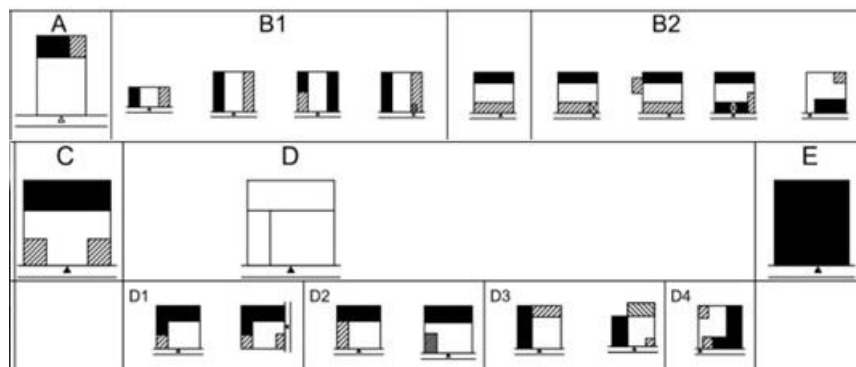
Ground floor plan typology of traditional Antakya houses (METU Graduate Program in Conservation of Cultural Heritage, CONS 507- Planning and Design in Urban Conservation, 2002)
